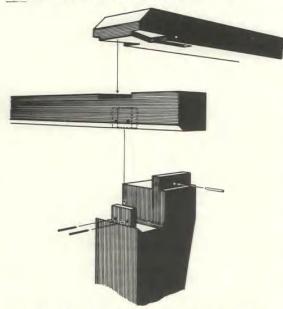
Method of joining corner-post, wallplate, and tie-beam in the Cumberland Street building.
